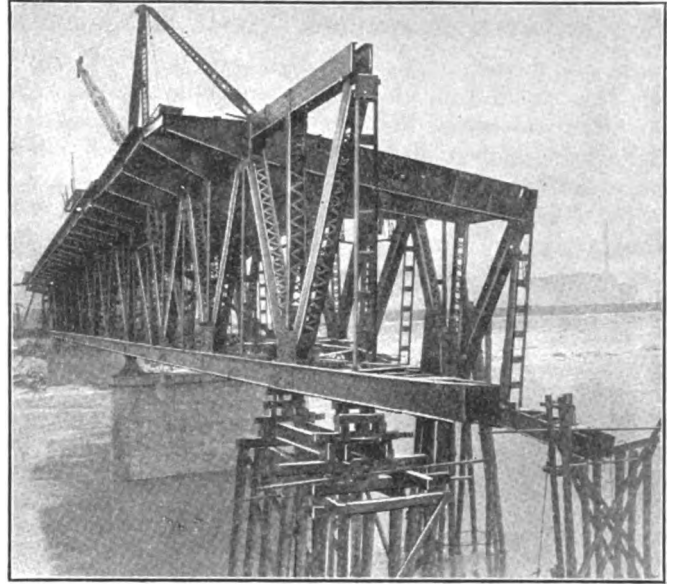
KANSAS AVE. BRIDGE AFTER WASHOUT OF FALSEWORK
